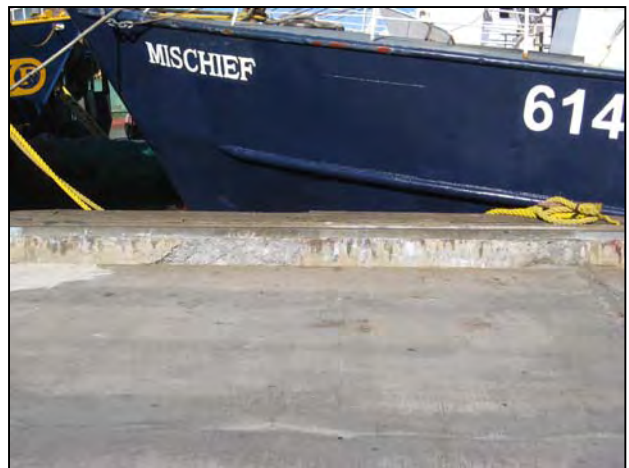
Spalling of concrete on top and face of curb.
